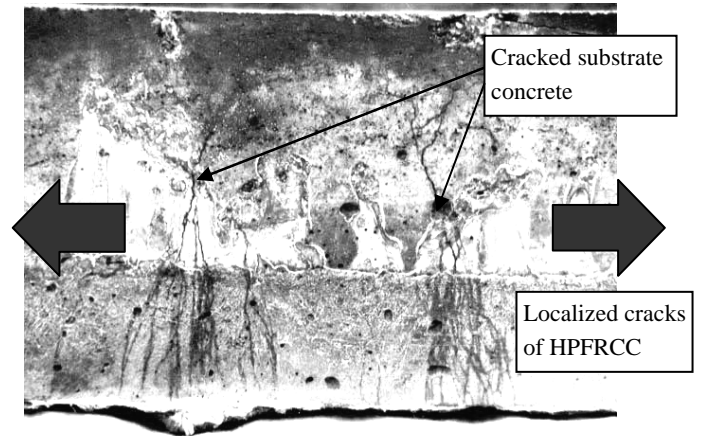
Localization of cracks distribution of HPFRCC adjacent to existing cracks of substrate concrete.
